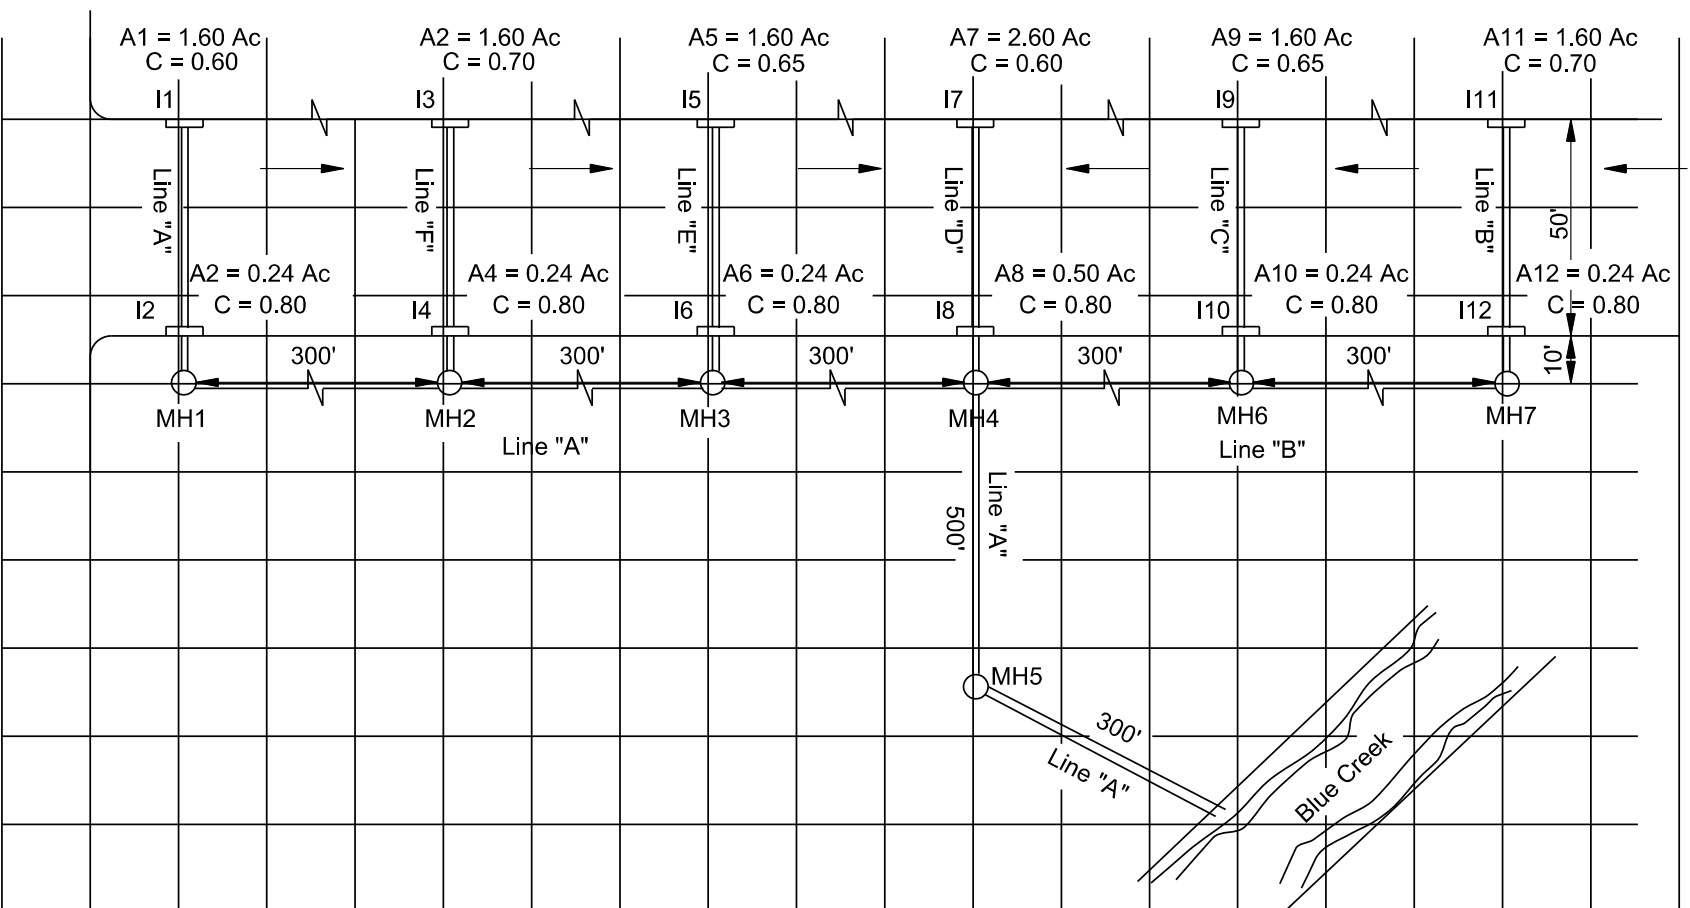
A — STORM SEWER SYSTEM LAYOUT
